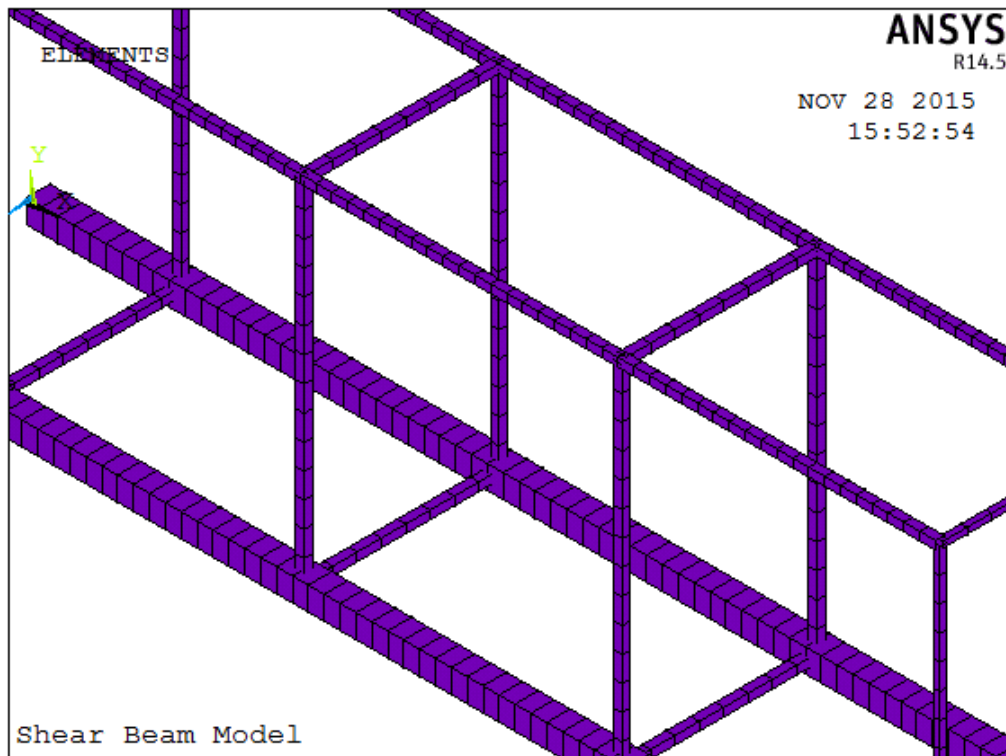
/a): Reinforcement Configuration– Shear Beam Model
